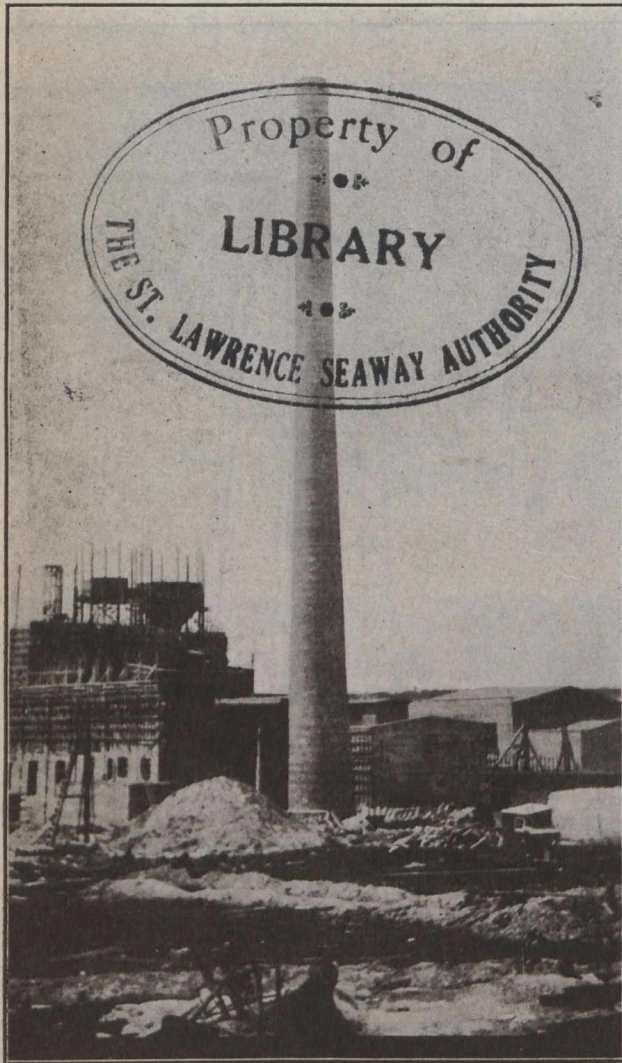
250-foot Brick Chimney Completed in Twenty-five Working Days
